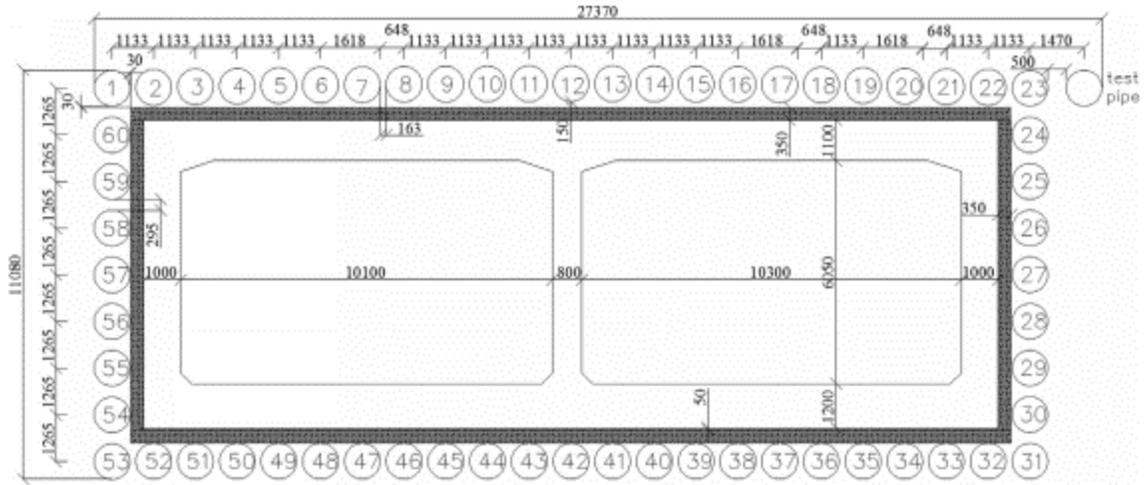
Finished Cross Section of the Twin Tunnels and Pipe Layout
